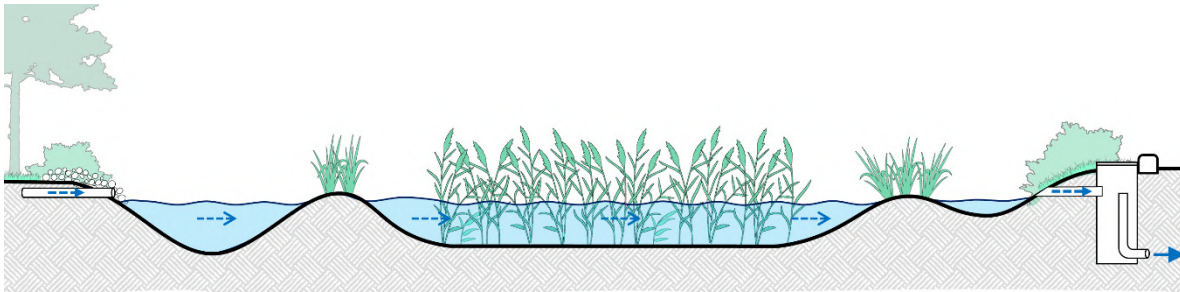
A schematic cross section of typical stormwater urban wetland (By Author)
